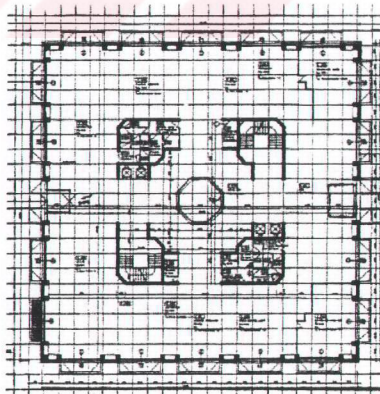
Şark Insurance Company Headquarters –ground floor plan.
